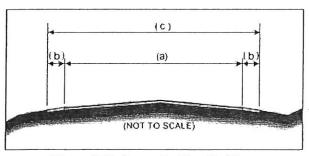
Cross-Section Profile --Residential Access Street with Reinforced Shoulder
